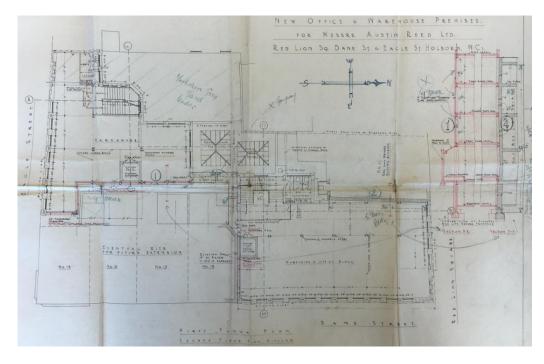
First Floor of Summit House dated 1923 - earliest drawing found
